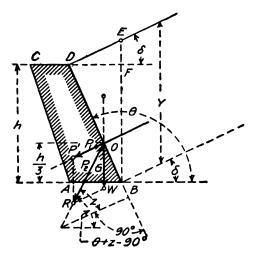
PRESSURE ON AN INCLINED RETAINING WALL.
